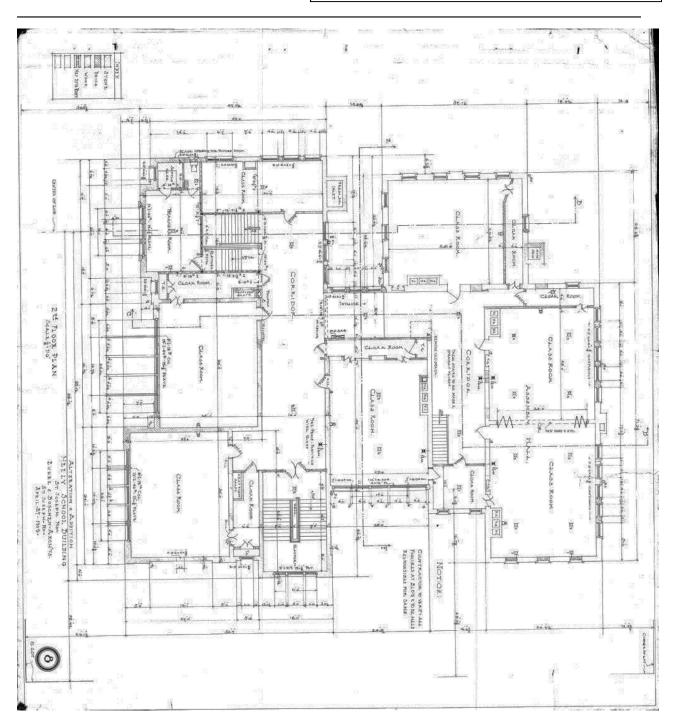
Eckel and Boschen Architects, Second Floor Plan, April 1909 (Architects 1909)
